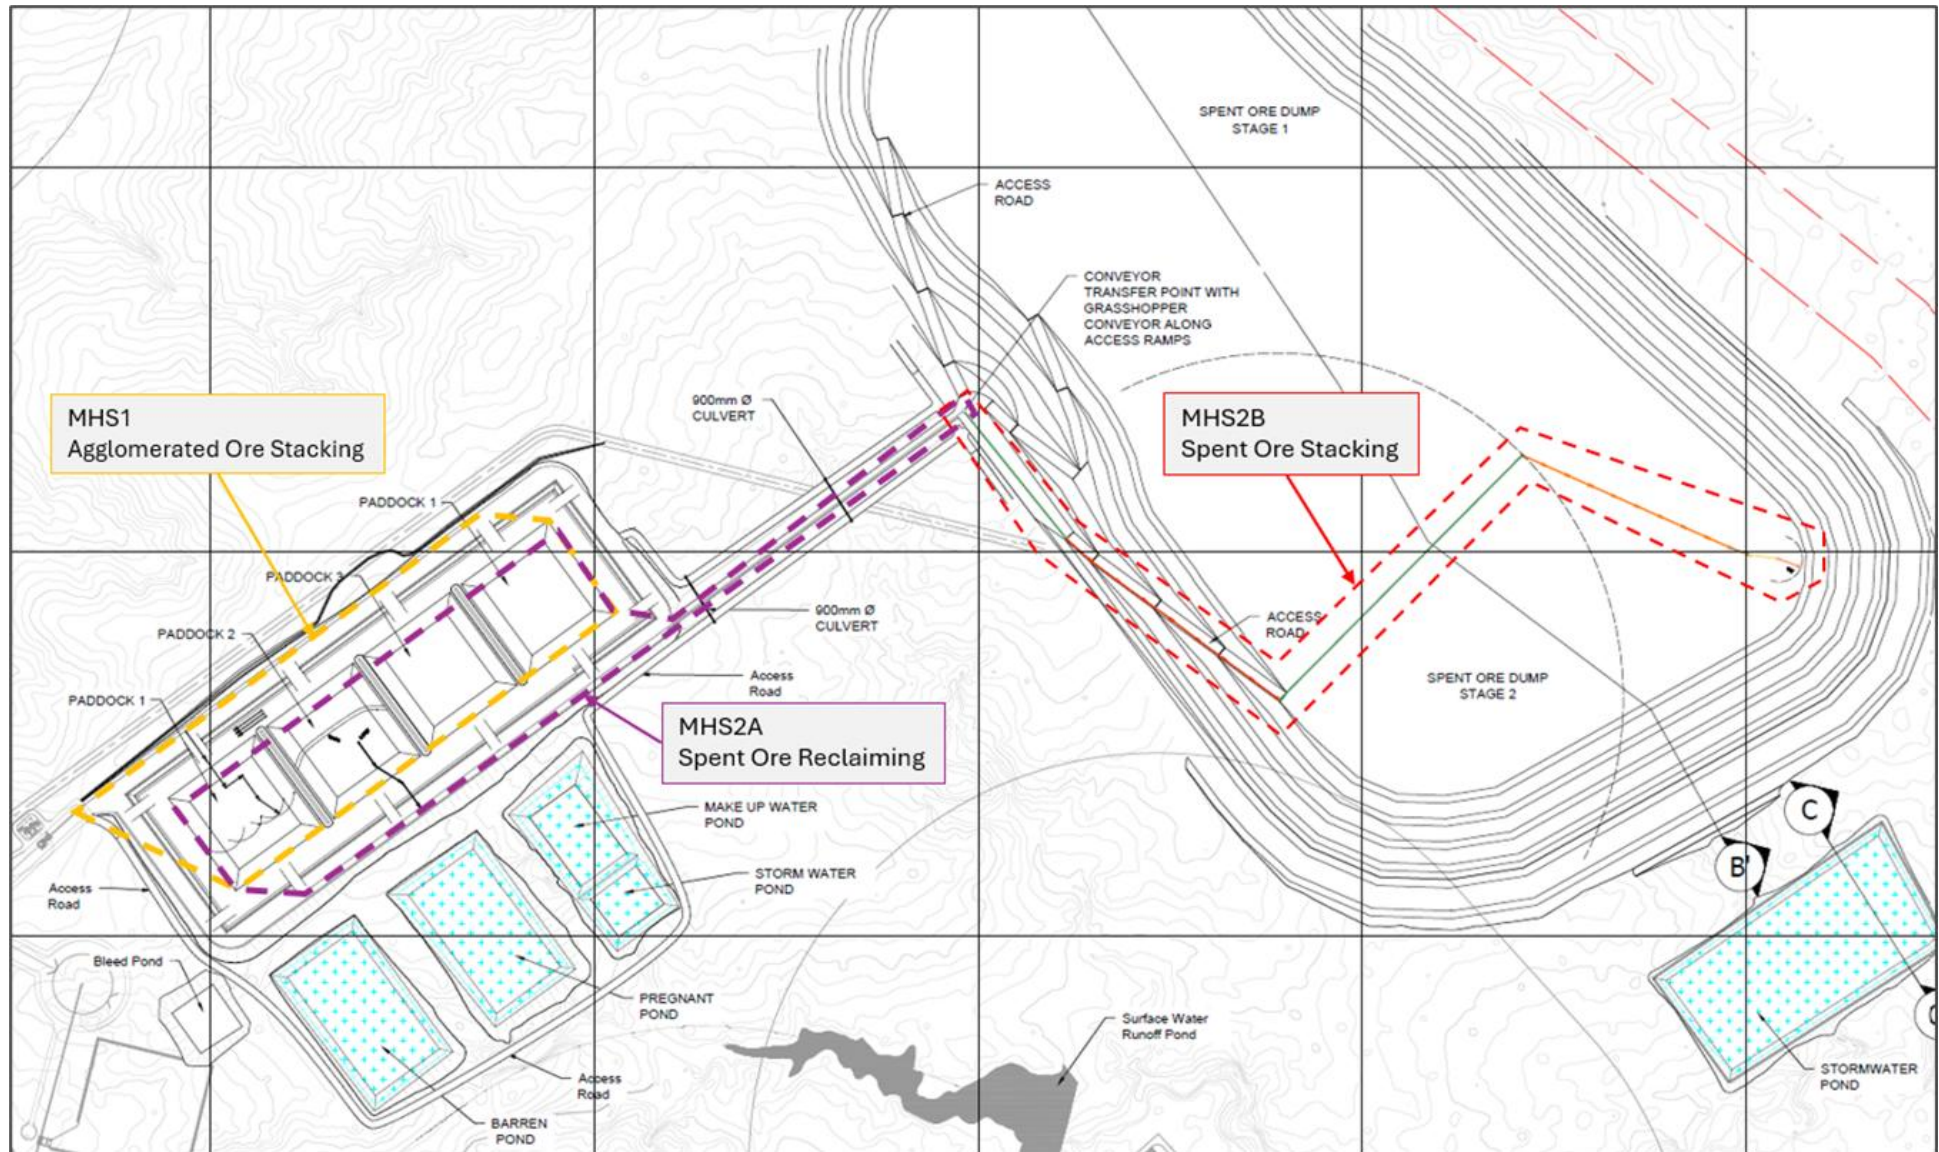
Layout showing the proposed stacking and reclaiming systems
